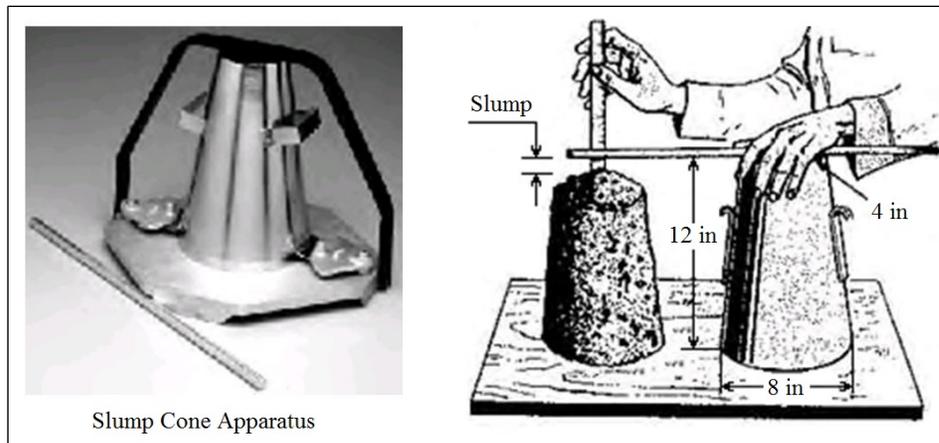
7: Slump Cone Apparatus and Testing Method
